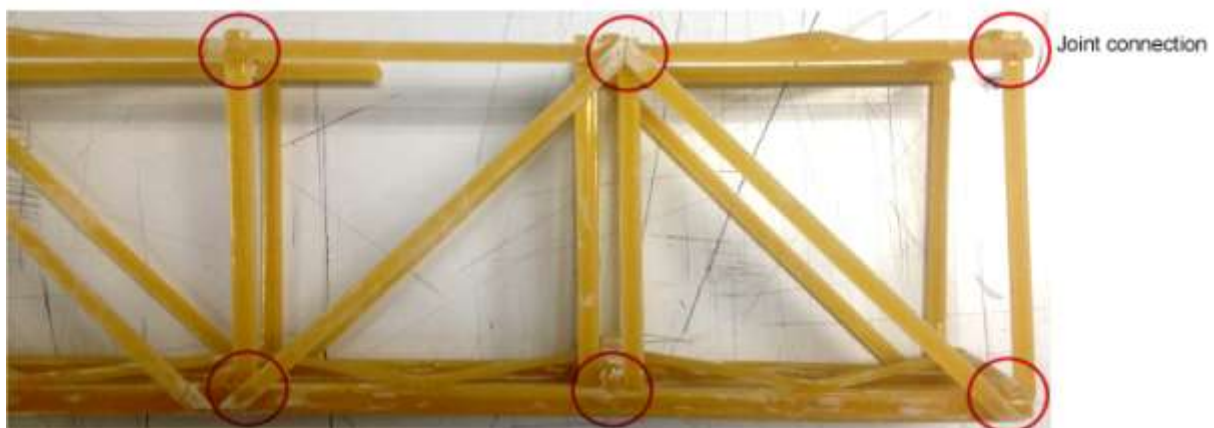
2    JOINT CONNECTION OF WARREN BRIDGE
